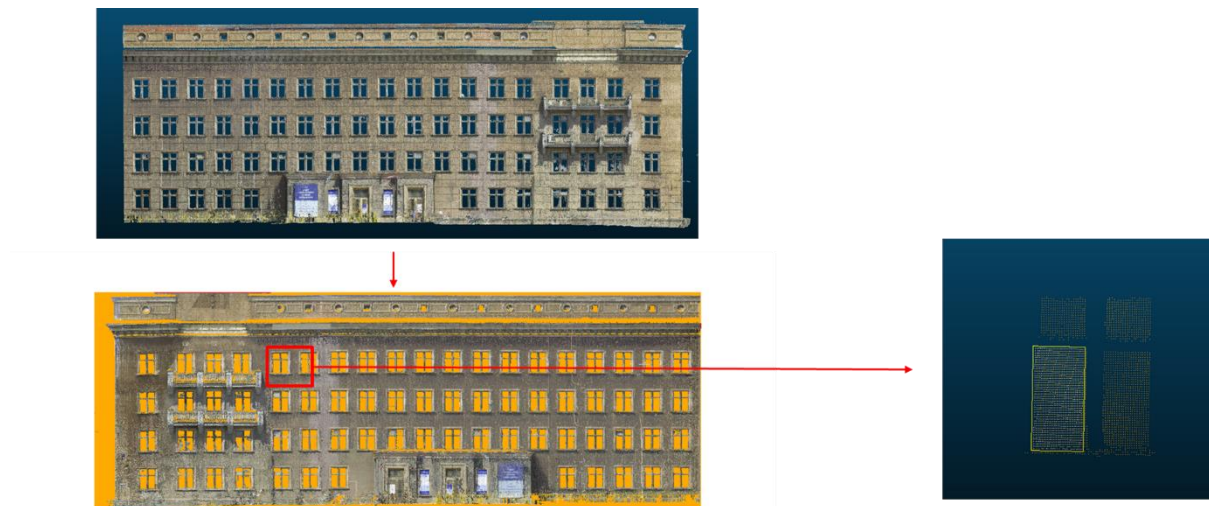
Detection of windows in the external wall and boundary extraction of one window
